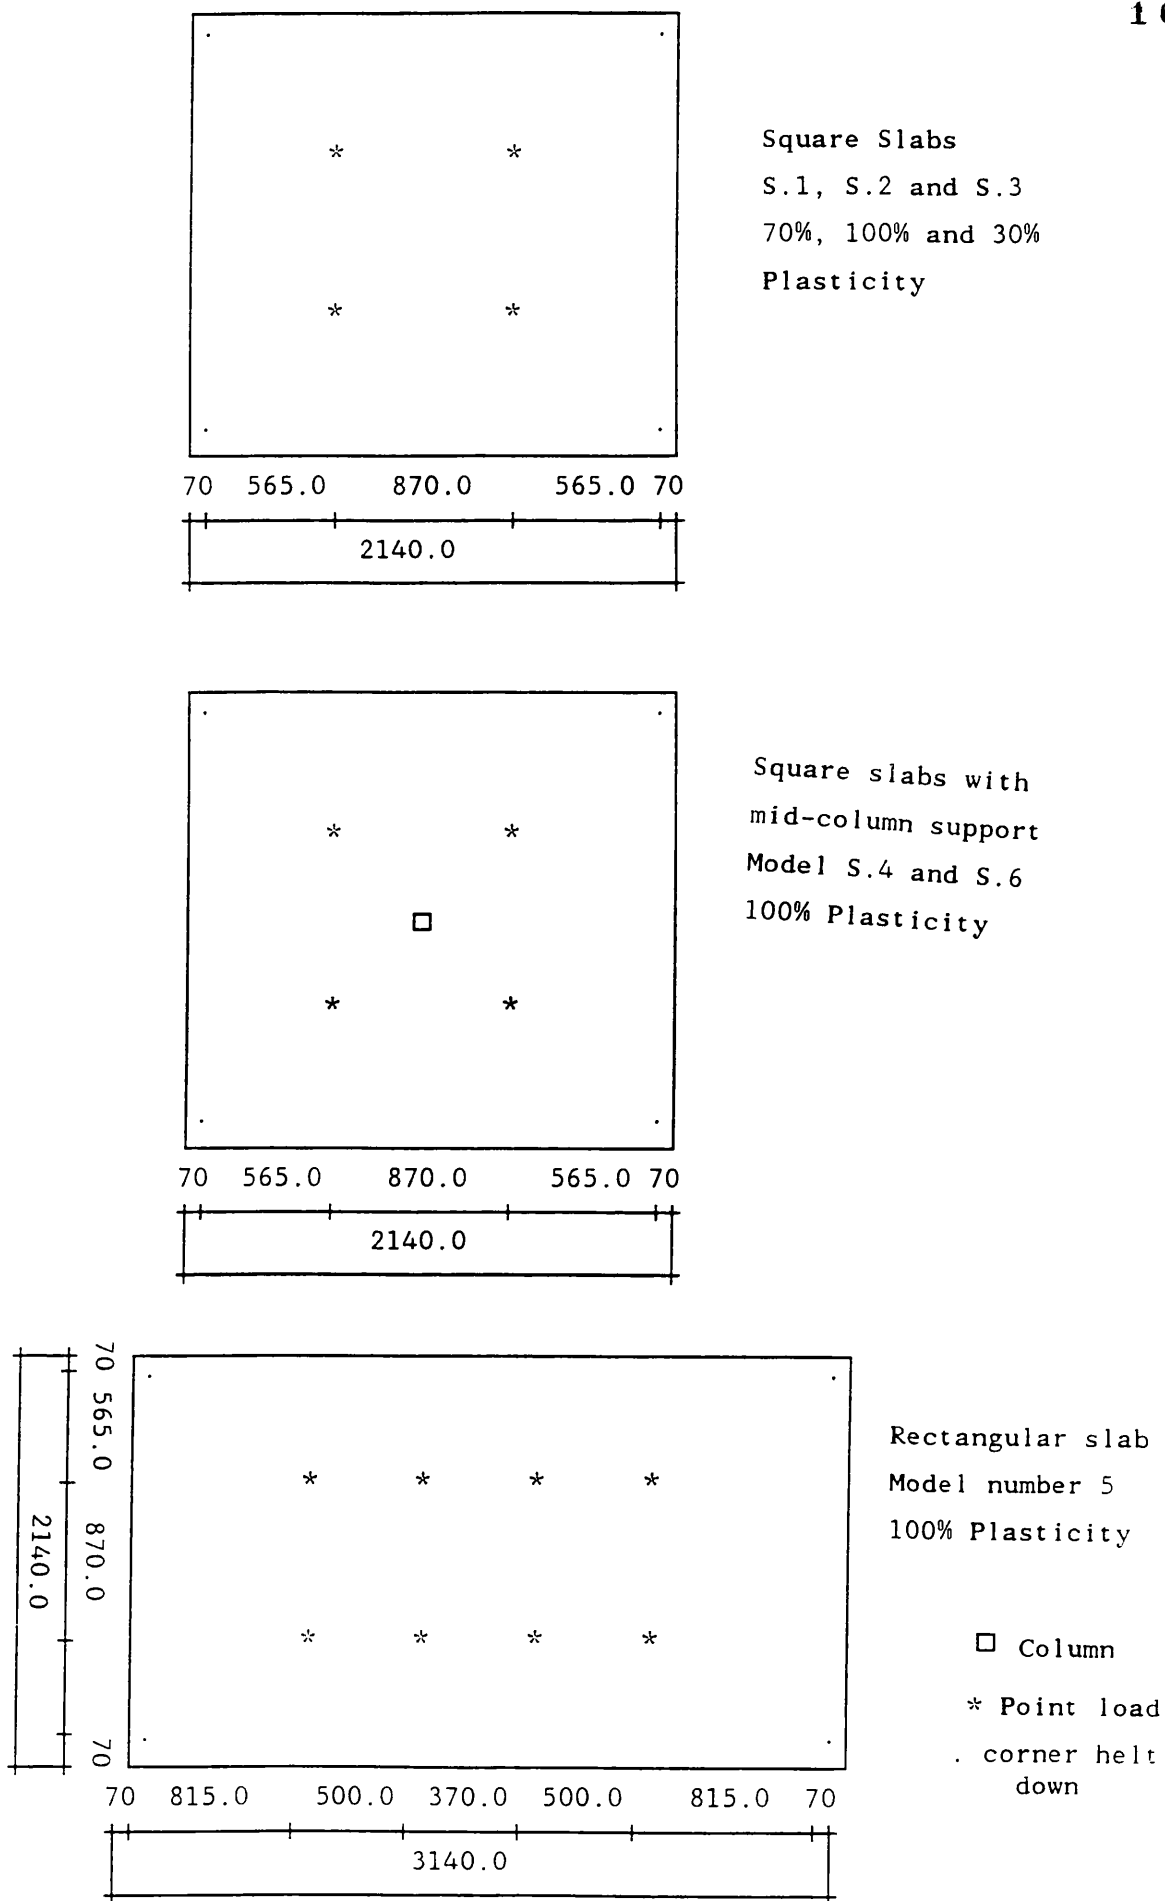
Slabs Dimensions, Support and Loading System.
